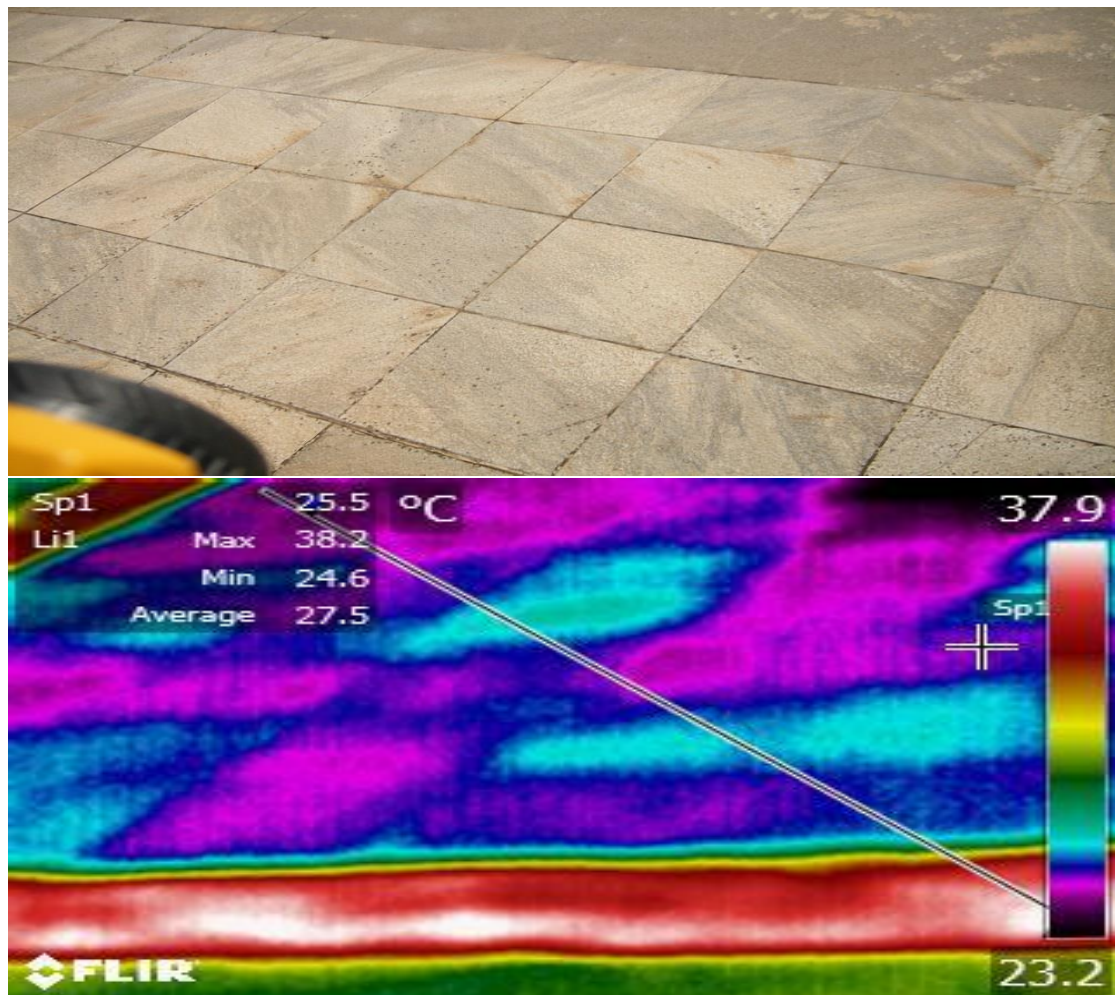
Thermal and visual photo of 3rd floor's roof tiles
